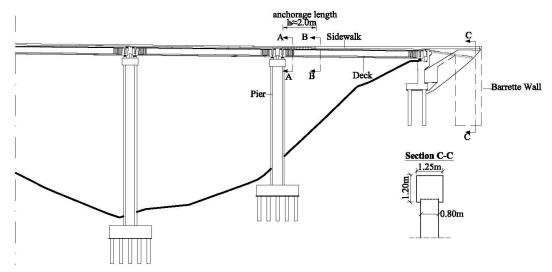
Longitudinal section of a precast I-beam bridge in which the proposed sidewalks-restrainers are implemented
